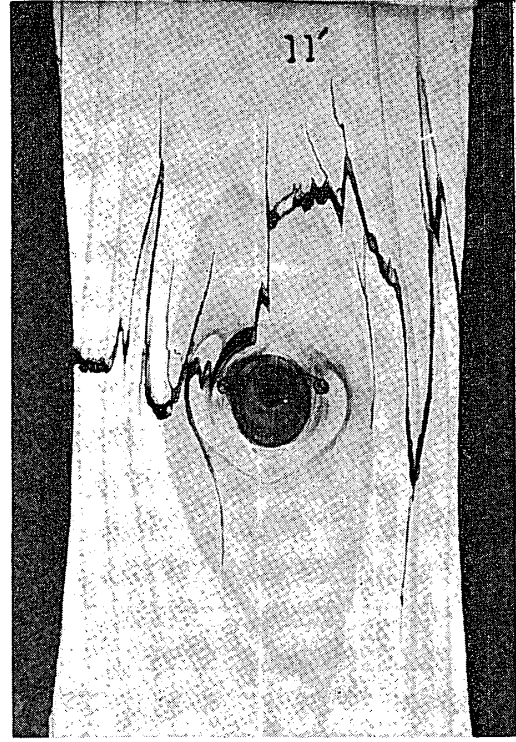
Pith side face of knotty specimen after failure test (Specimen No. 11).
